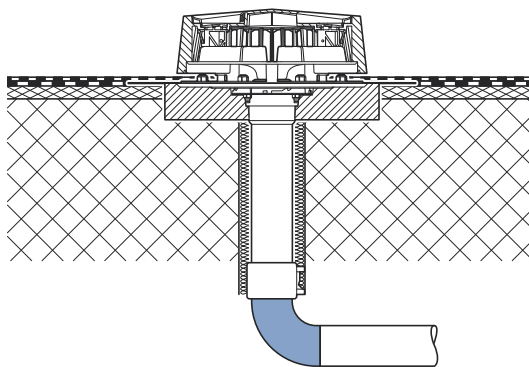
Connecting the Geberit Pluvia outlet with a 90° bend
